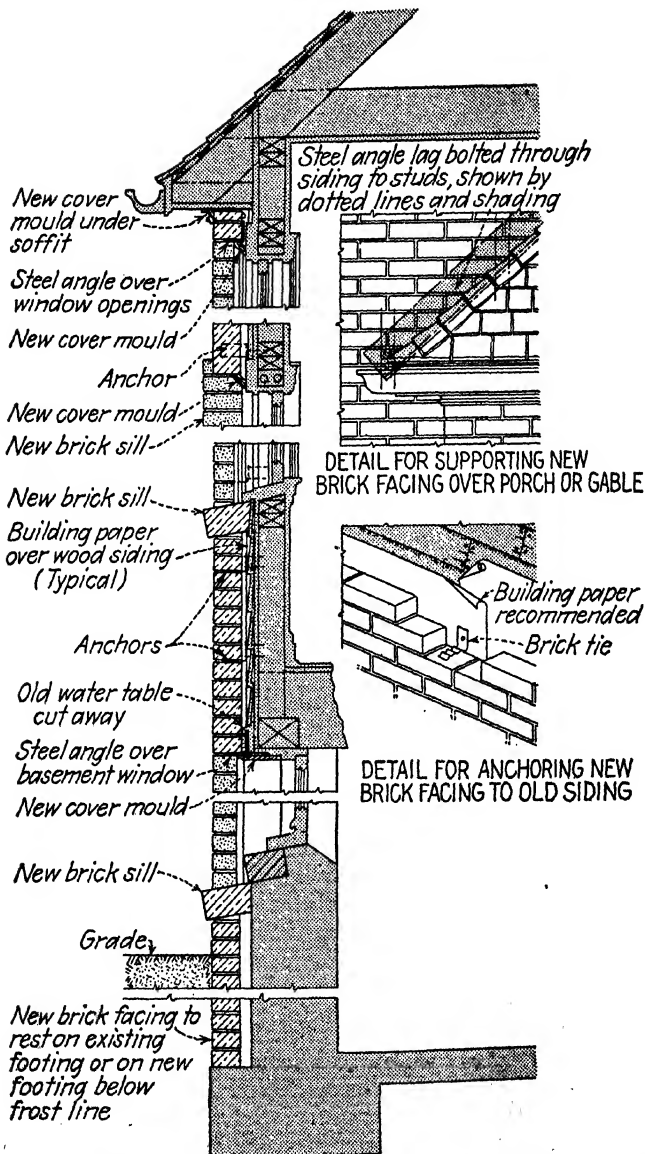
Application of brick veneer to existing frame construction, with details of method of anchoring brick to old siding and of supporting brick over gables and wide openings. Similar construction may be employed in new buildings over sheathing and building paper attached to studs.
